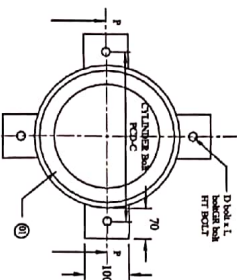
DETAILS OF BEARING ASSEMBLY AT 'R-R'
